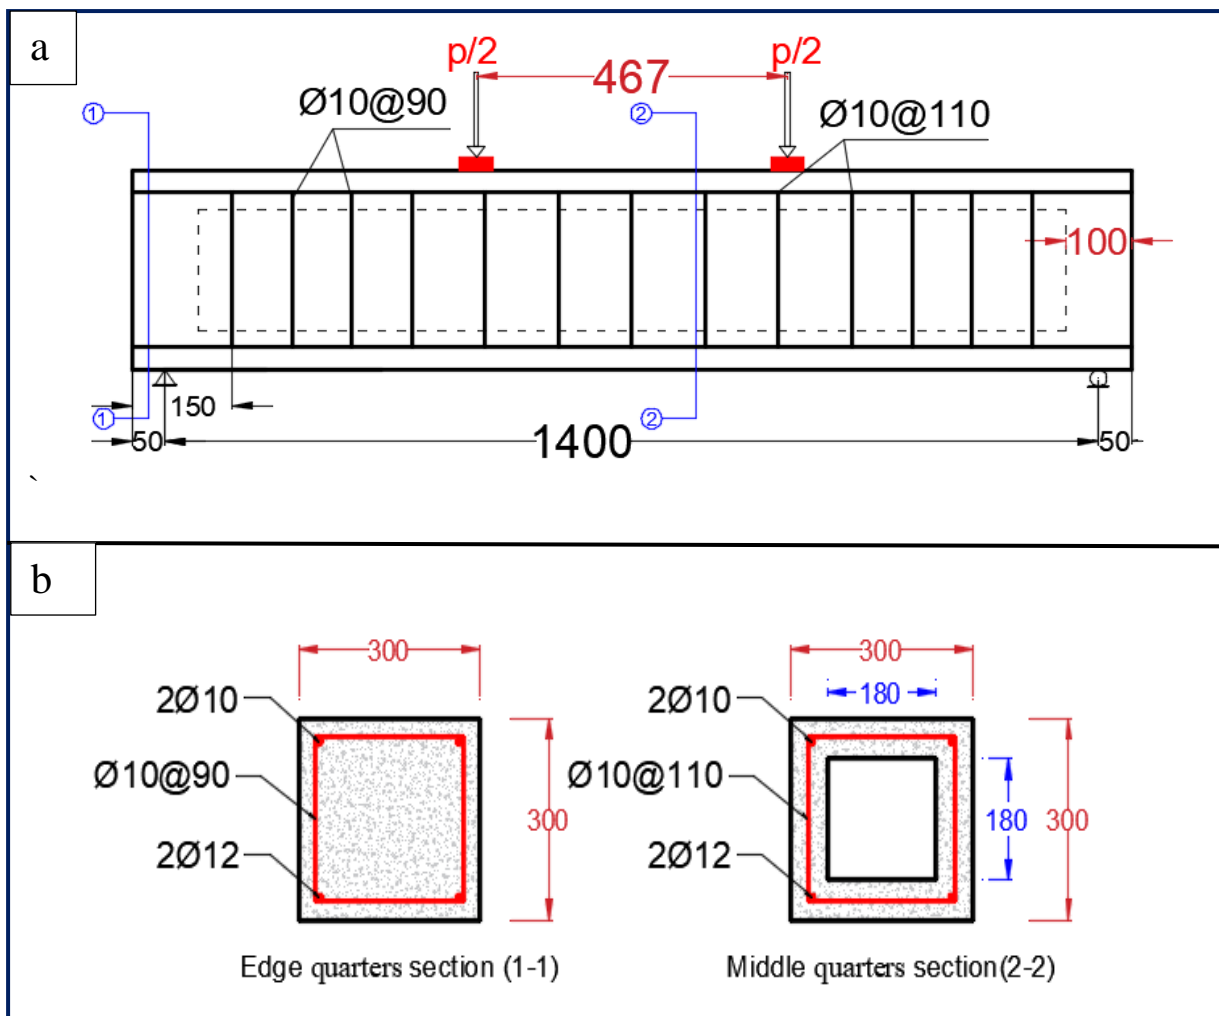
1: Reinforcement details for all the hollow beams (All dimensions in mm)
